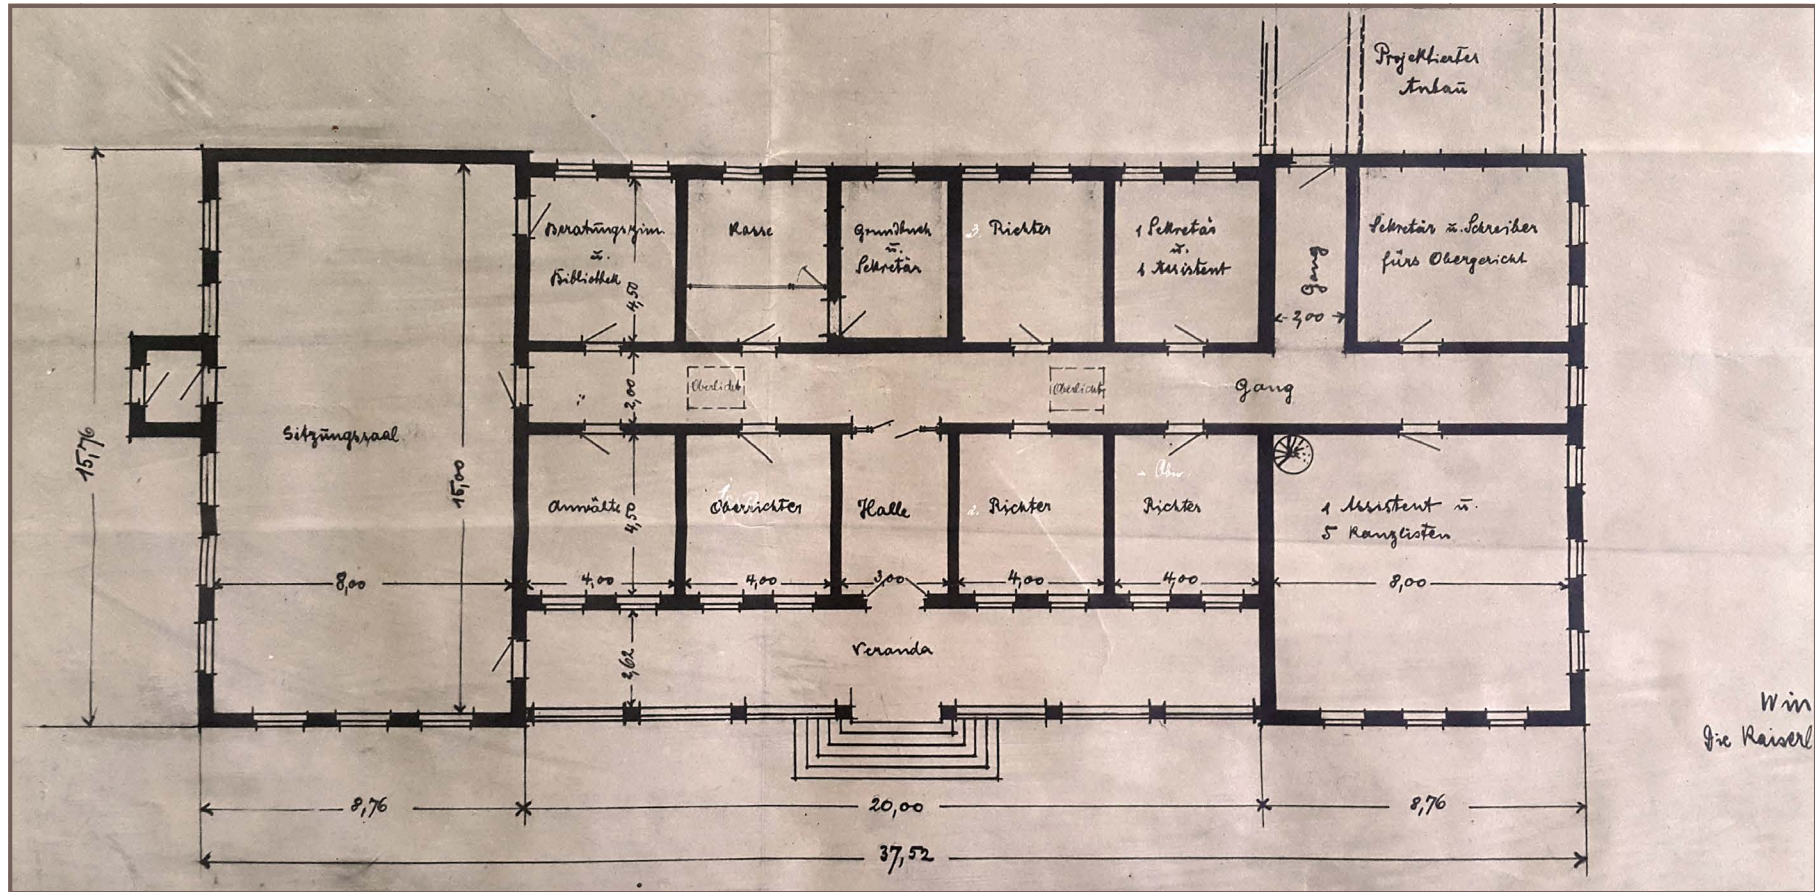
Photograph of the floor plan sketch of the Old Court building.
